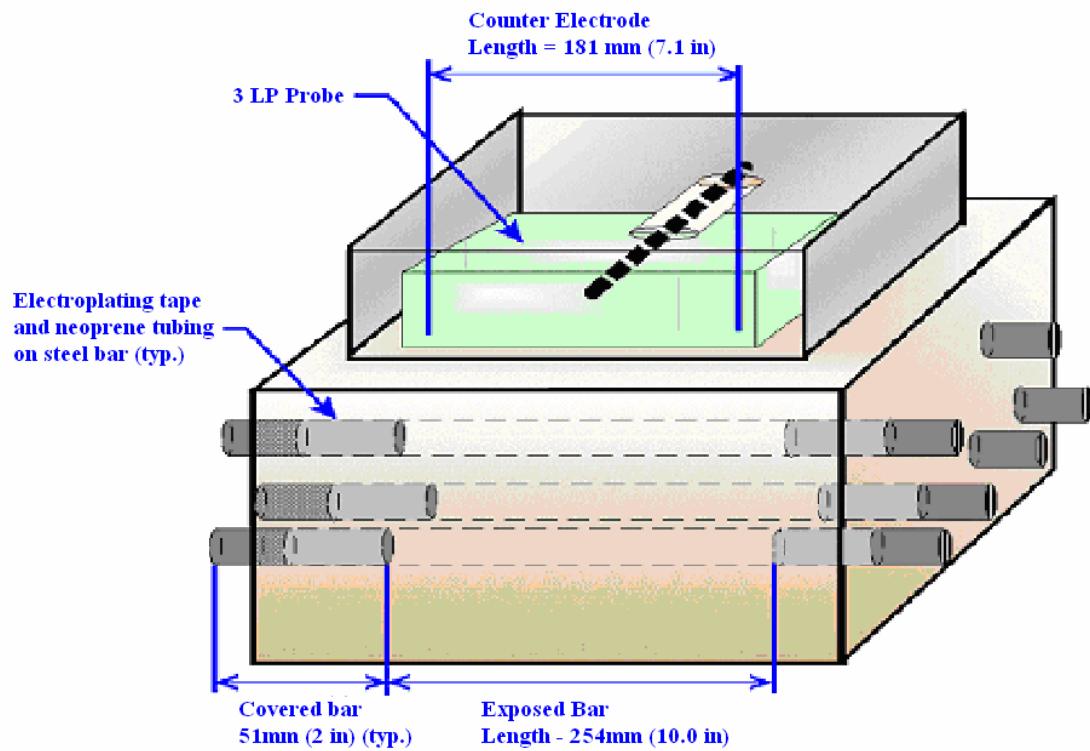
Plan View of Exposed Reinforcement Area (Brown, M.C. 1999)
